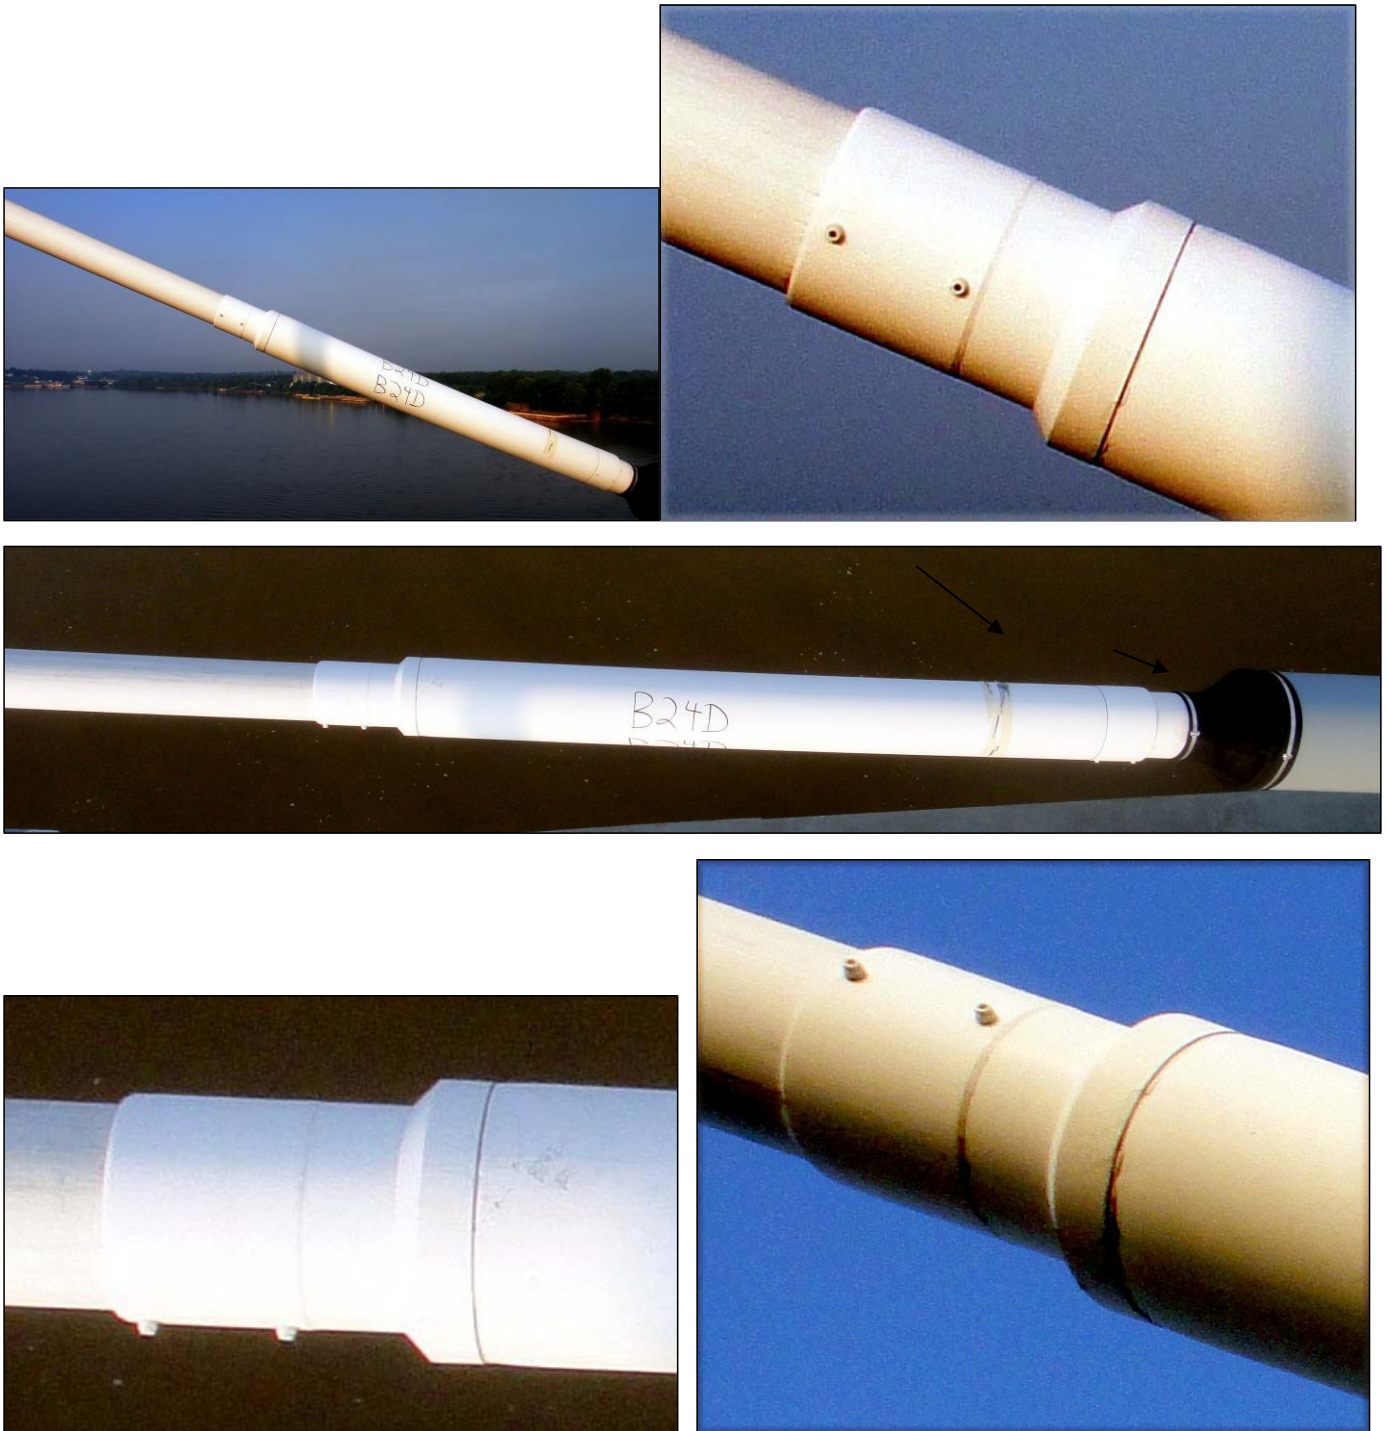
B24D: Reducer to Electro Weld Coupling to Stay Pipe Views (Not Cracked)
